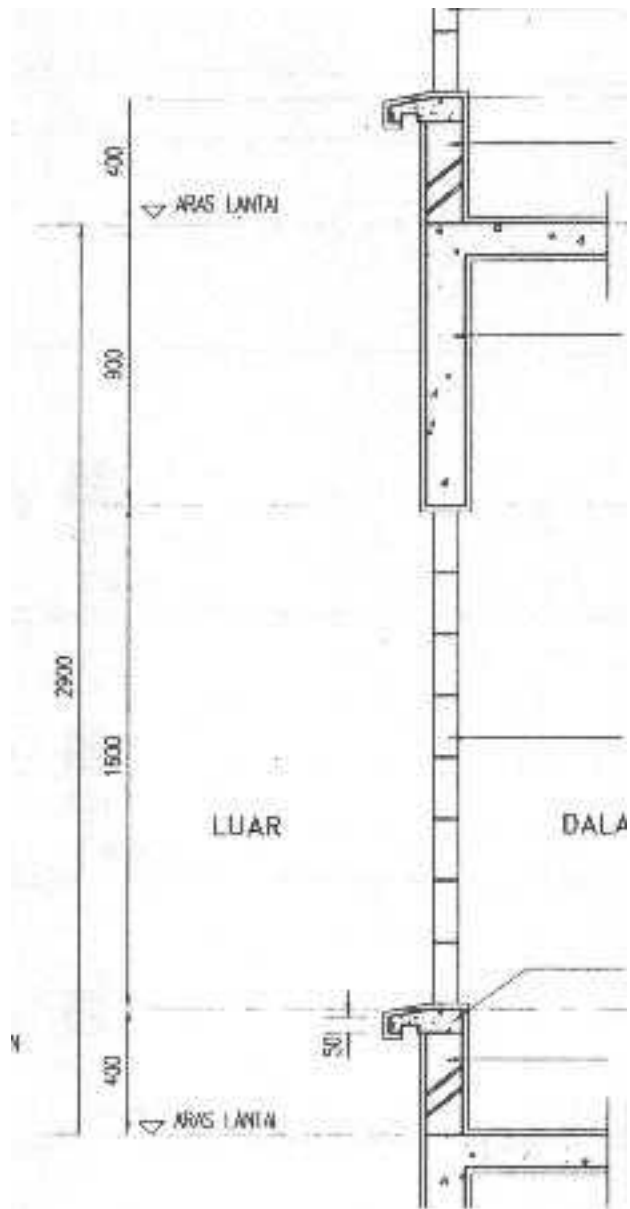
Critical Structural Details (e.g. wall section, foundations, roof-wall connections, etc.)
